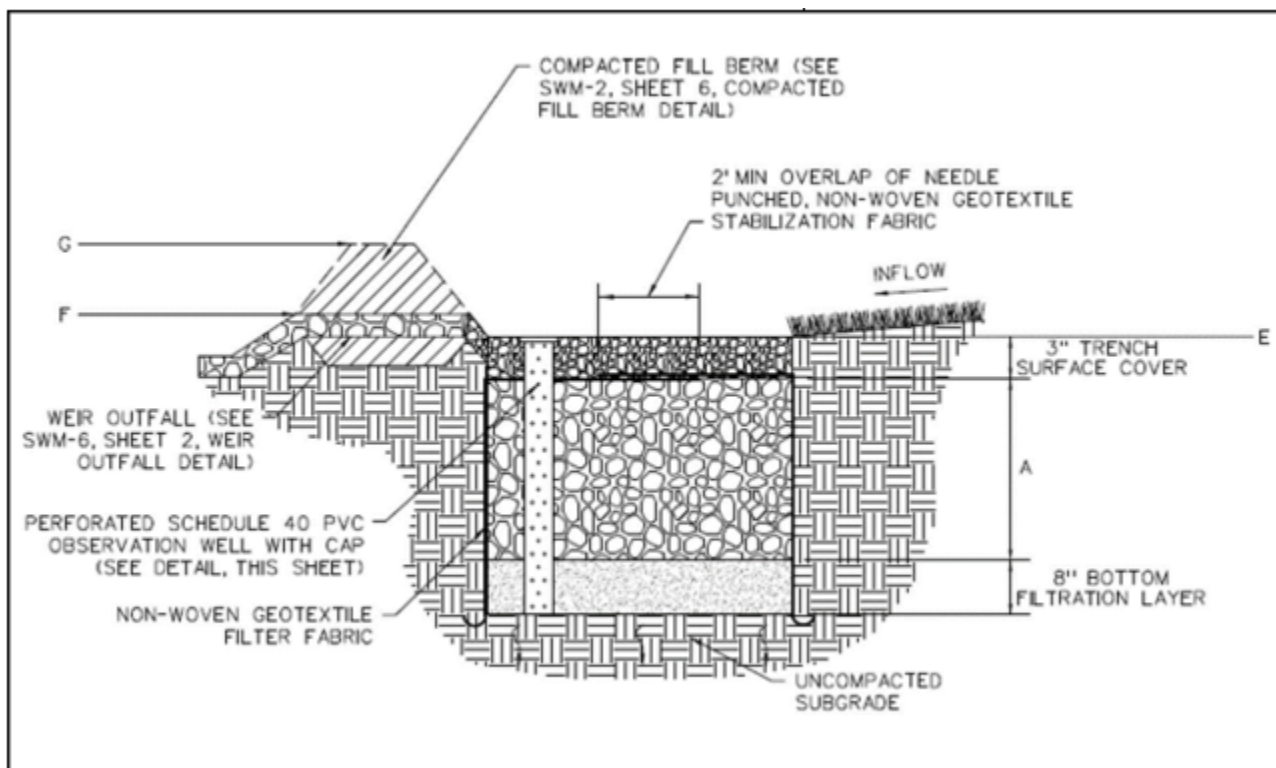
Infiltration Trench Cross Section (without subdrainage)
